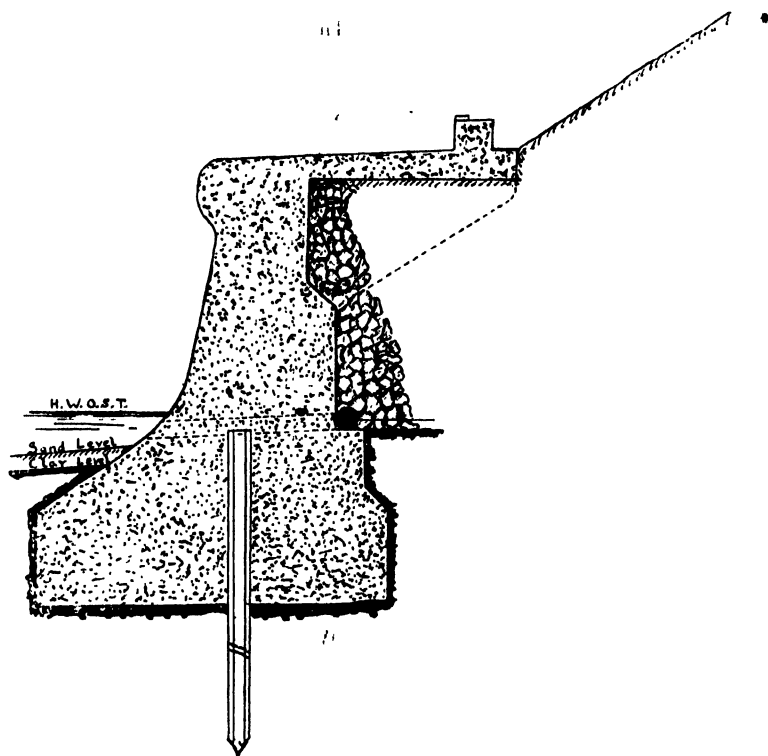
Mass-Concrete Sea Wall (where stone facing or concrete-block facing is too expensive).
